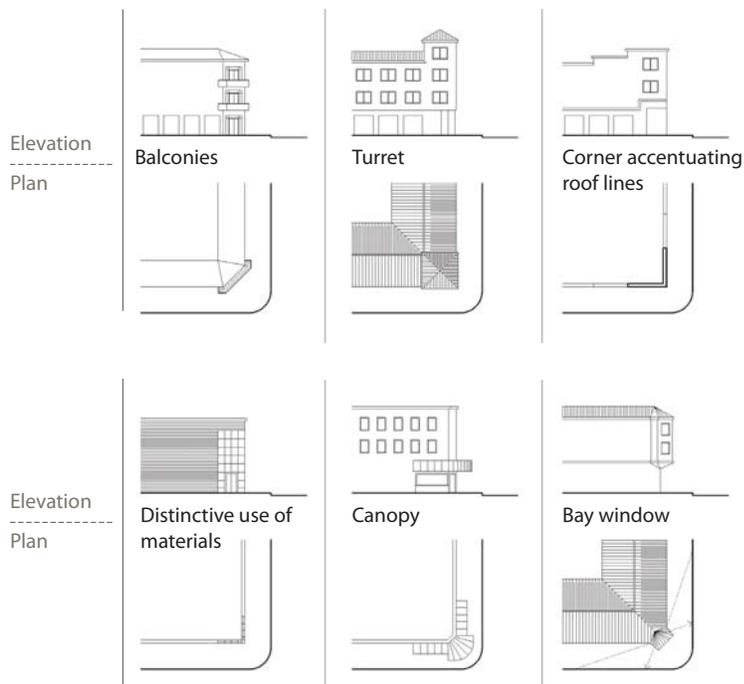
Acceptable corner treatments in both elevation and plan.
